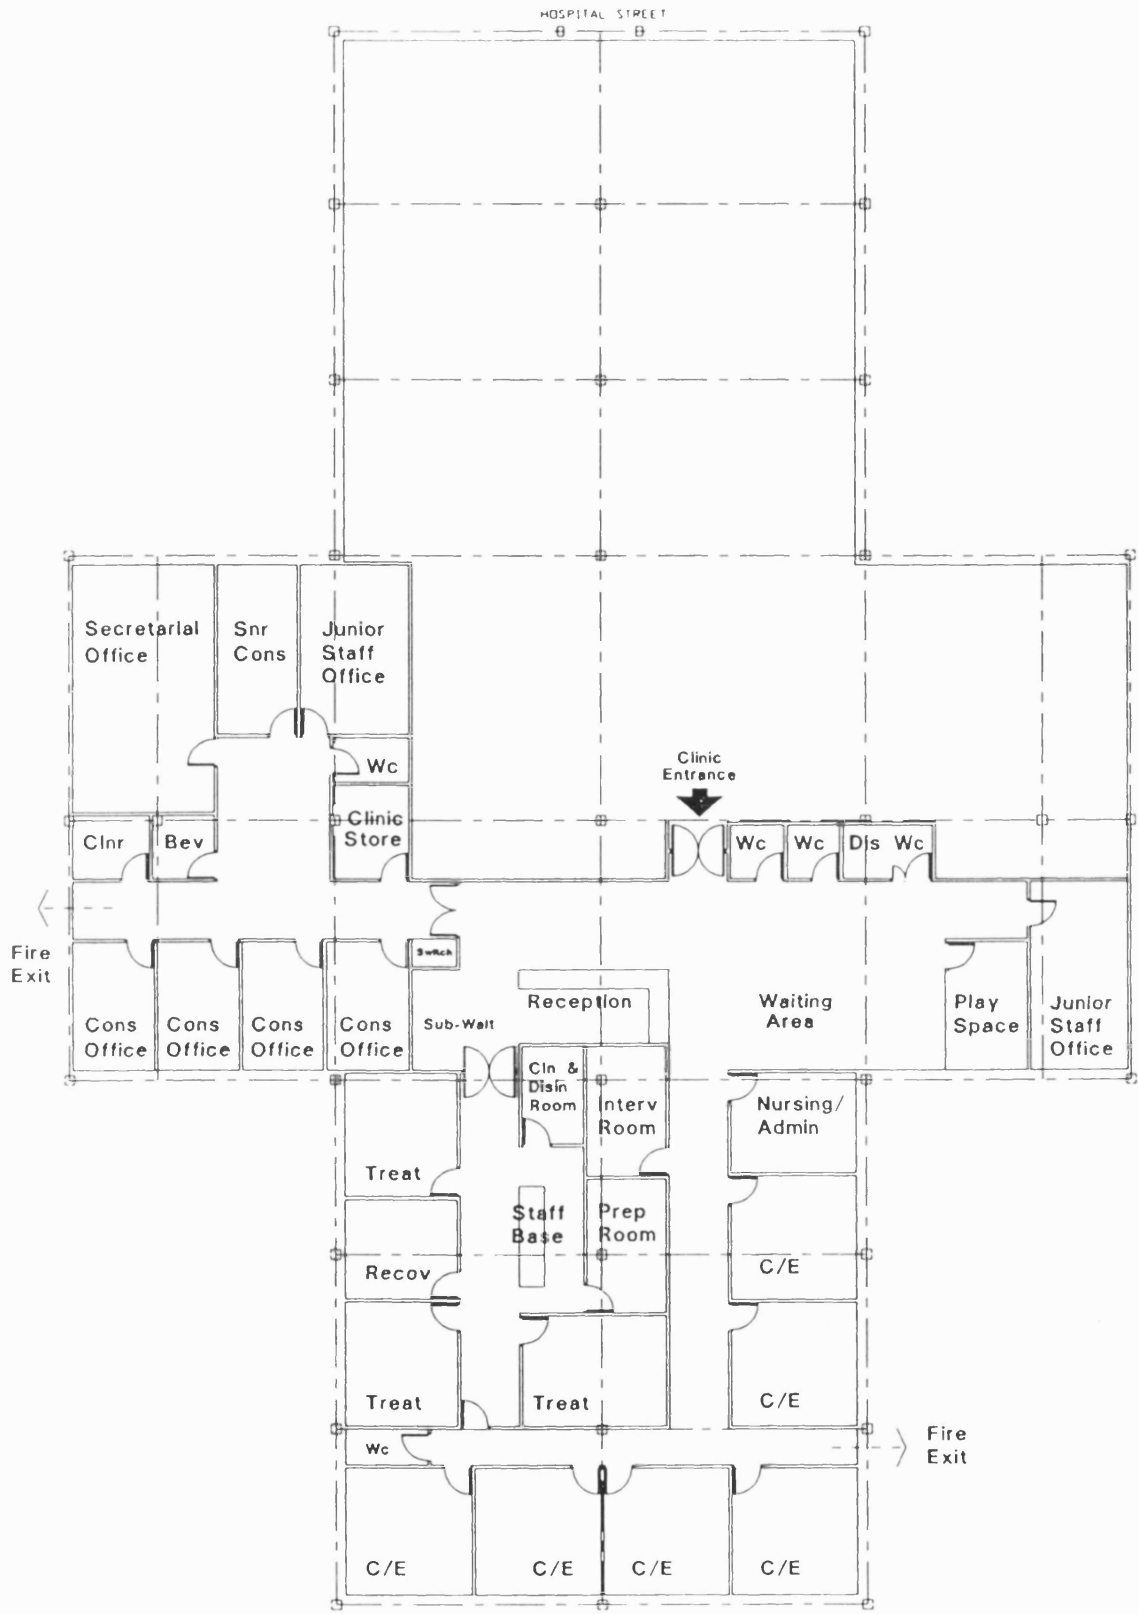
Notional layout plan for a 6 consulting room ENT clinic within a Nucleus footprint. HBN 12, Supplement 3, p28
